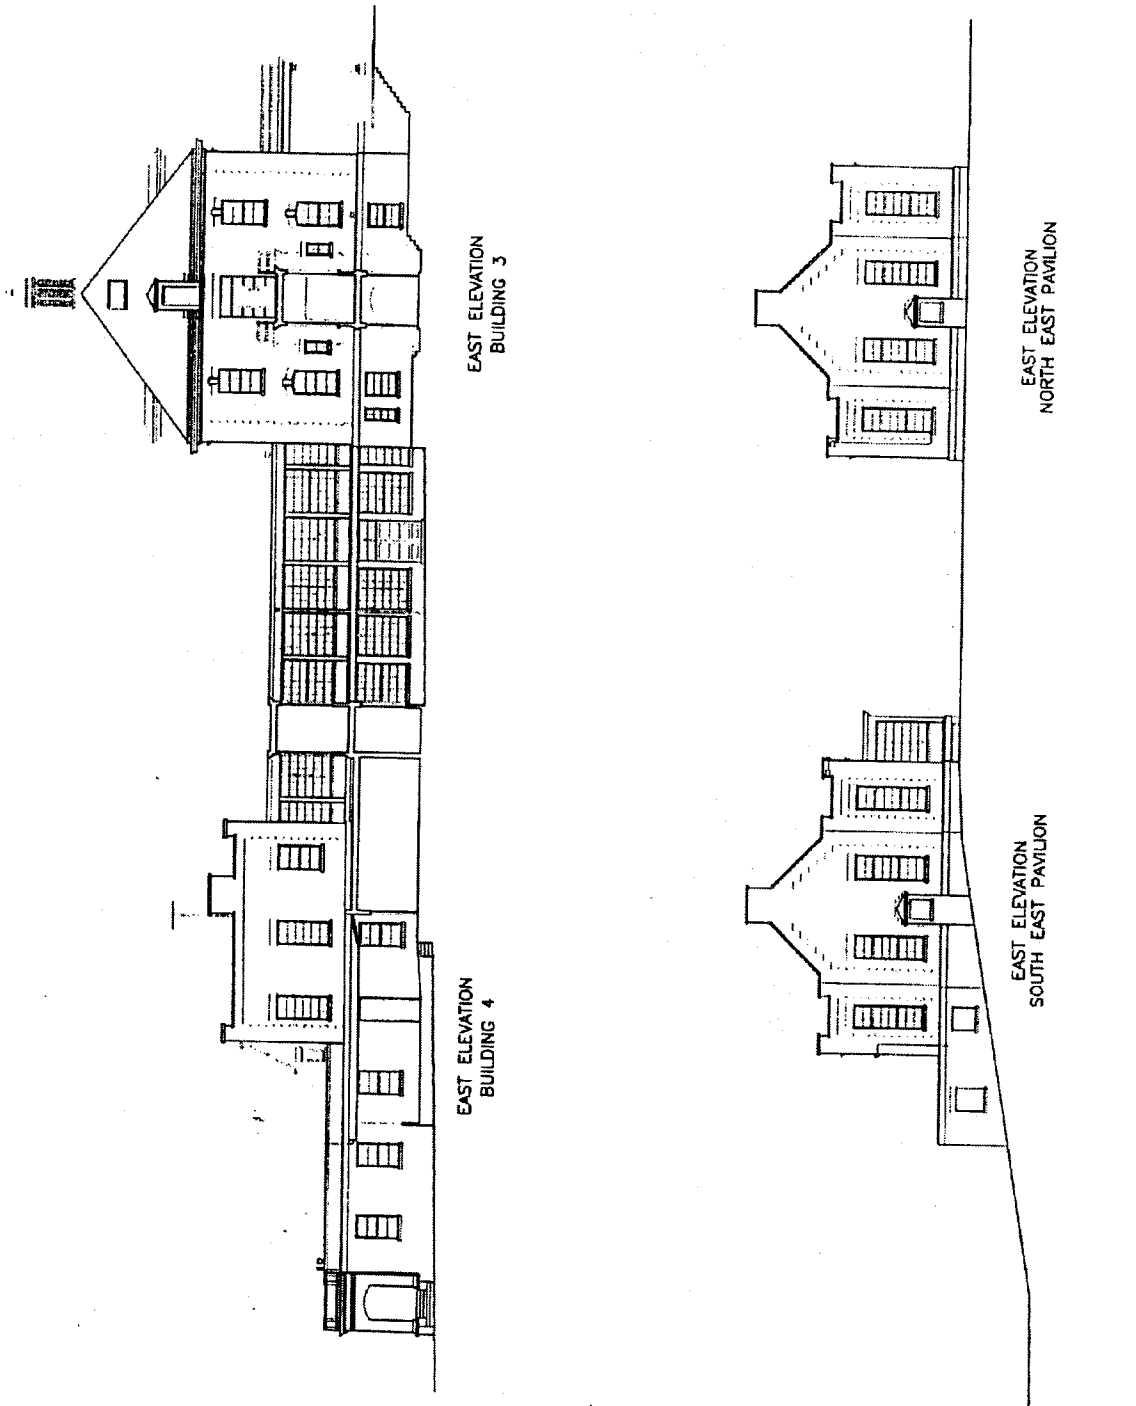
Figure C Building 3 and Building 4. East Elevations. These elevations represent the conditions of the building as they existed in 1994. They also show how the glazed solarium corridors connect Buildings 3 and 4 with each other and with the ward pavilions.
